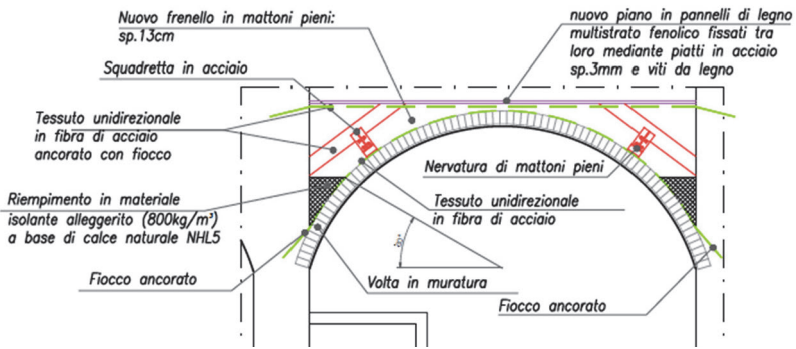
Rocca of Sissa Diaphragm walls on vaults-design
